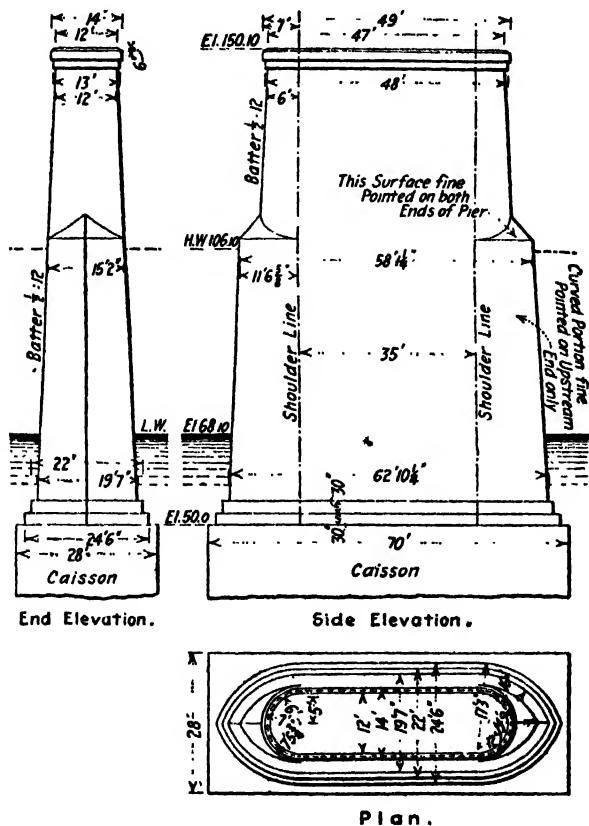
General Dimensions of Pier 3 of the McKinley Bridge.
